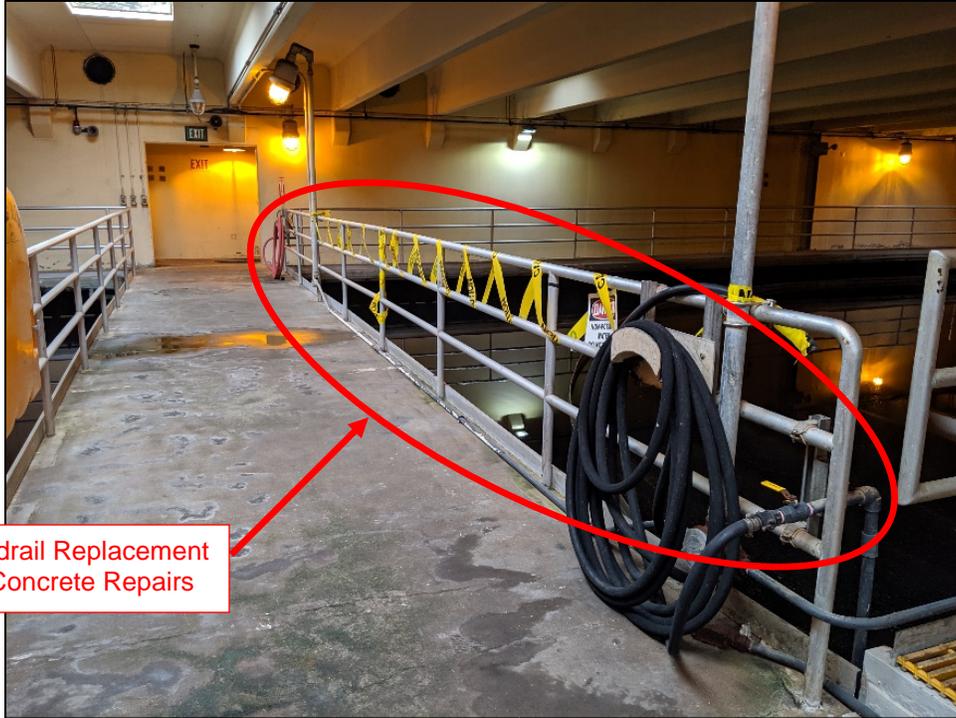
Existing Equipment Inside Heating and Mixing Building No. 1
